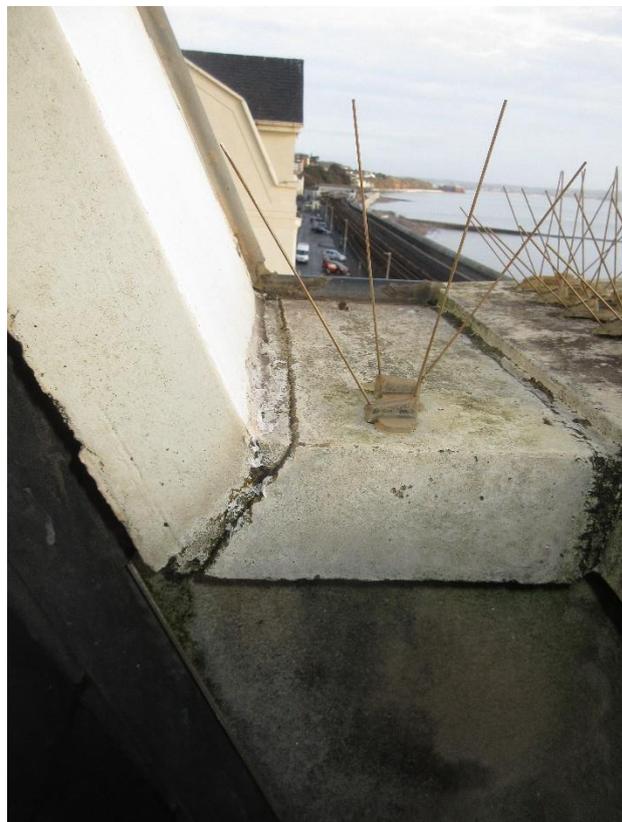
Parapet copings stones have cracks in joints into which water can penetrate, possibly exacerbated by the metal or PVC trim added.
